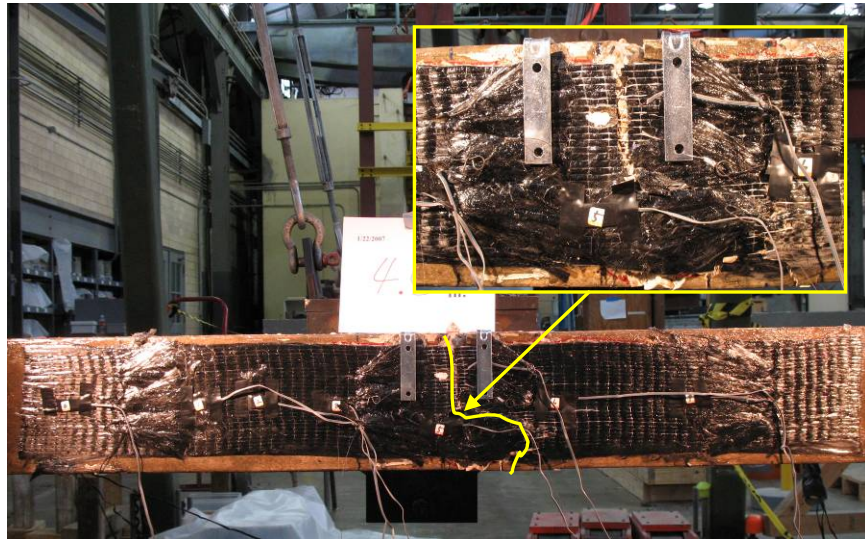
Failure of A-BF-A-5S, fracture of CFRP sheet
